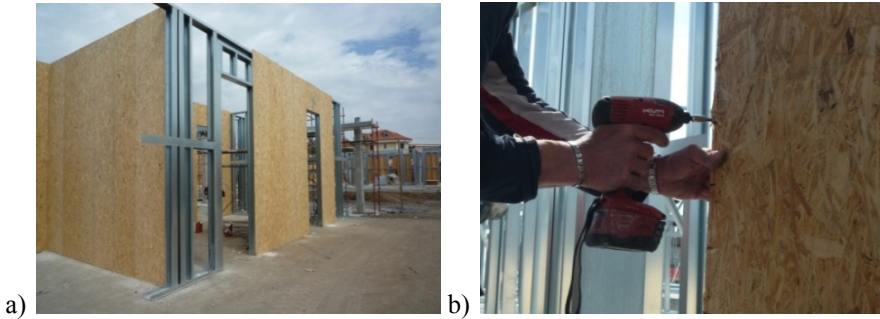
(a) Wall lateral bracing given by sheathing-to-frame interaction;
